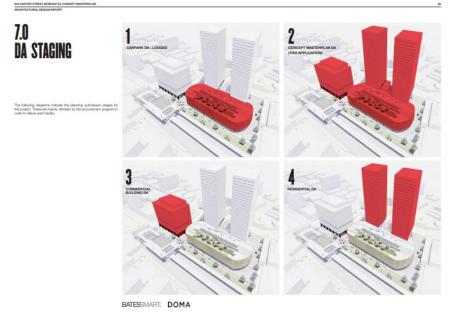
Staging Plan - Approved Concept Master Plan (Source Bates Smart)
